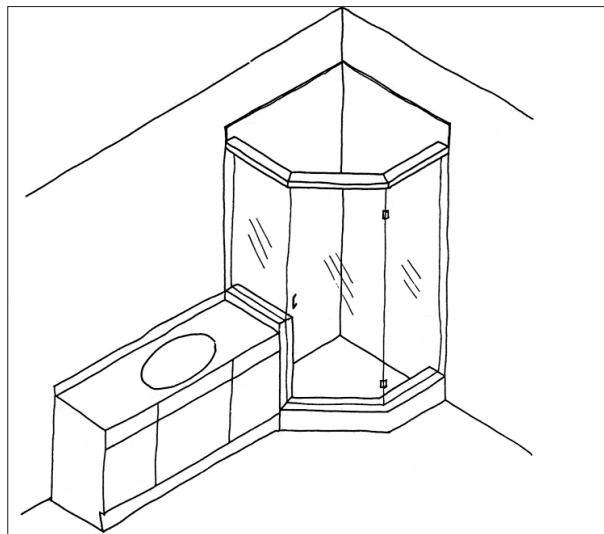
If the lav butts the shower wall, leave a short wall in place between it and the shower, build a vanity there, and tile it.
